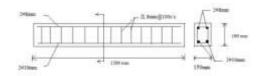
Reinforcement Details of Test Beam-1, 2, 3,4
